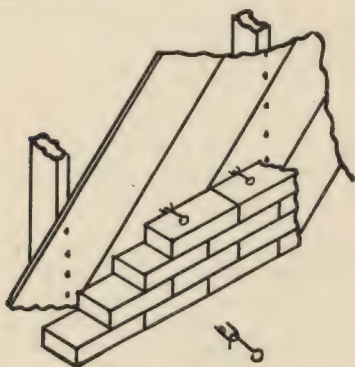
Method of Bonding Brickwork Veneer to a Wooden Building.
